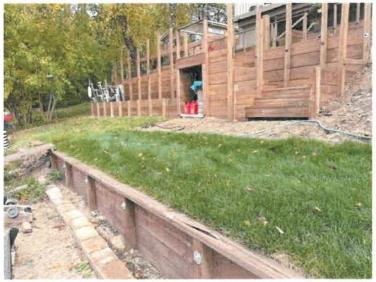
Looking north from south property line at the existing retaining wall at beach, This will be the limits of possible fill indicated on the plans.
